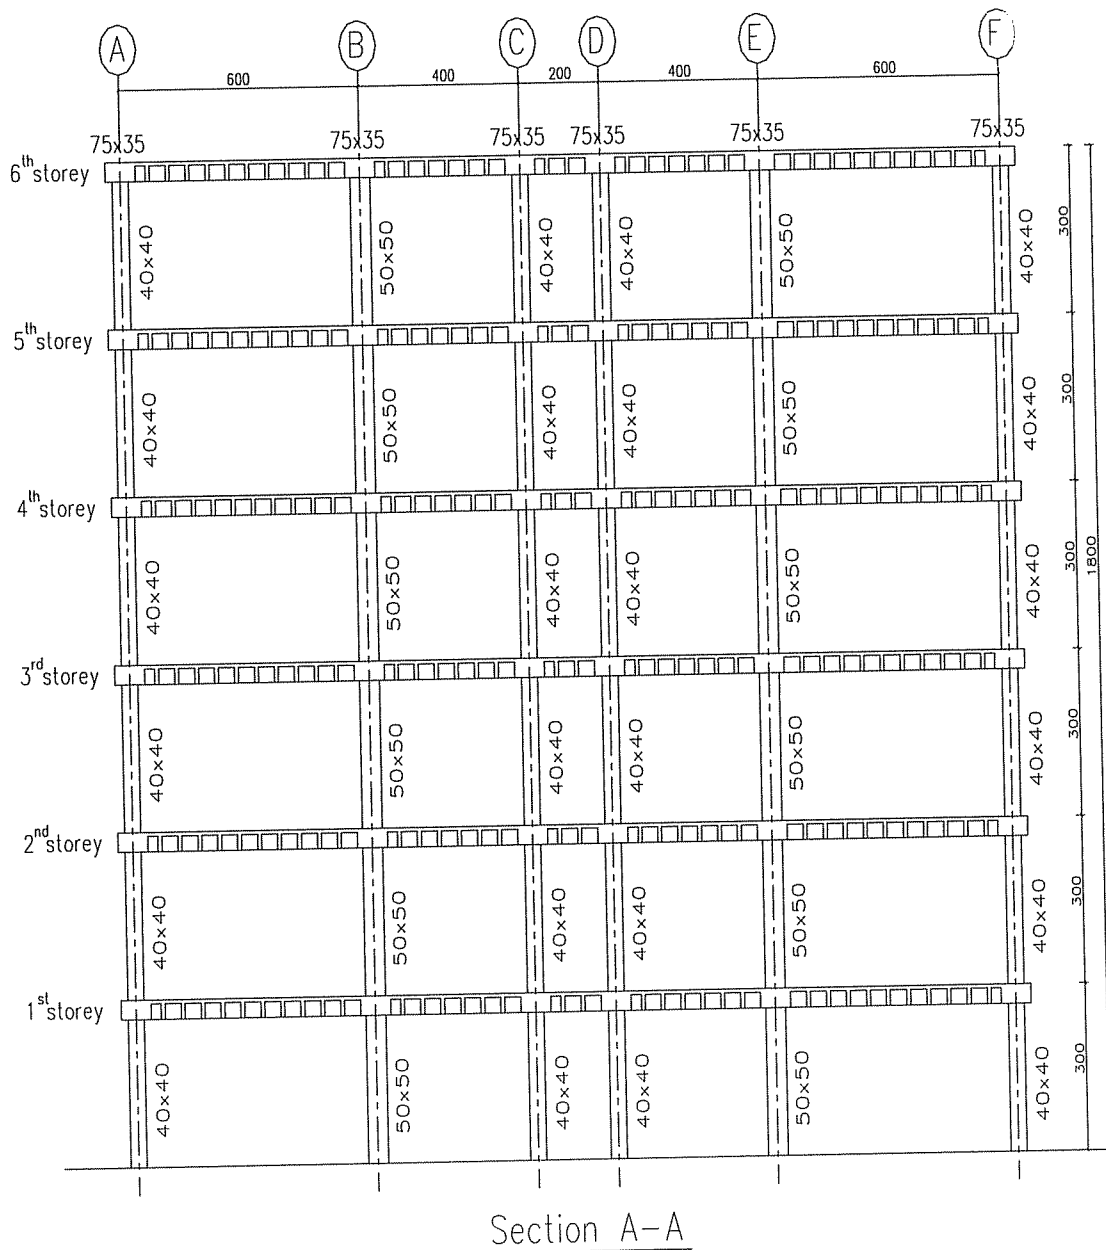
Section A-A of six-storey R.C. wall-frame system with the same story height.
